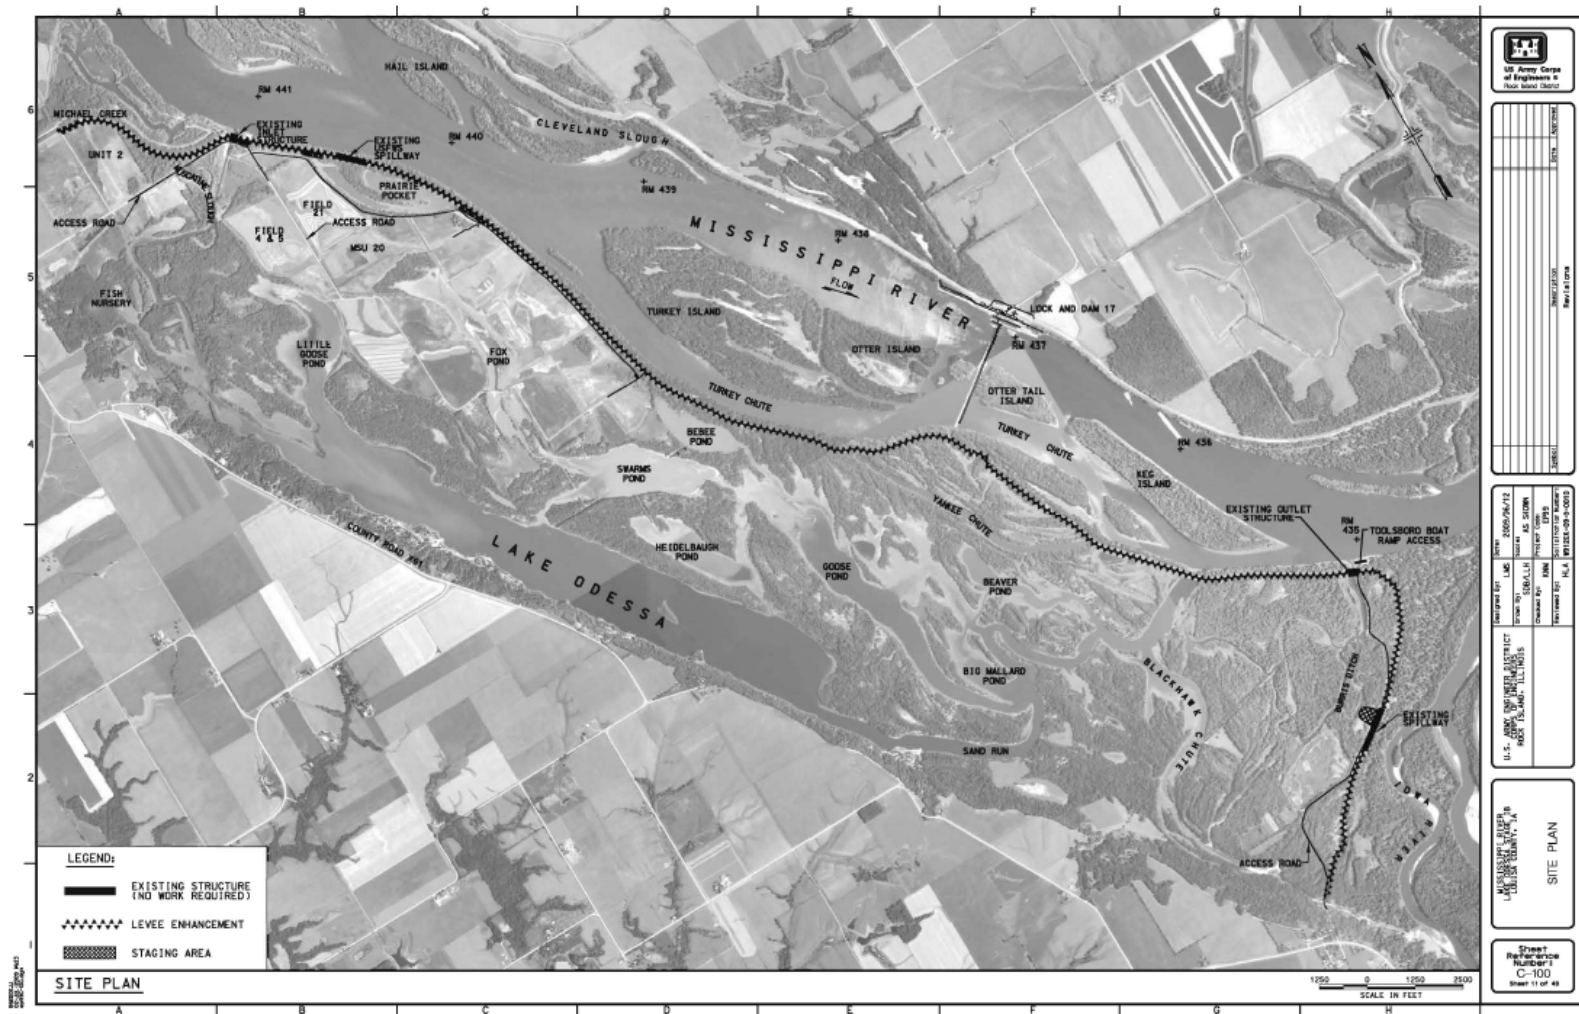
W912EK-09-C-0099 (Stage IB) Site Plan
